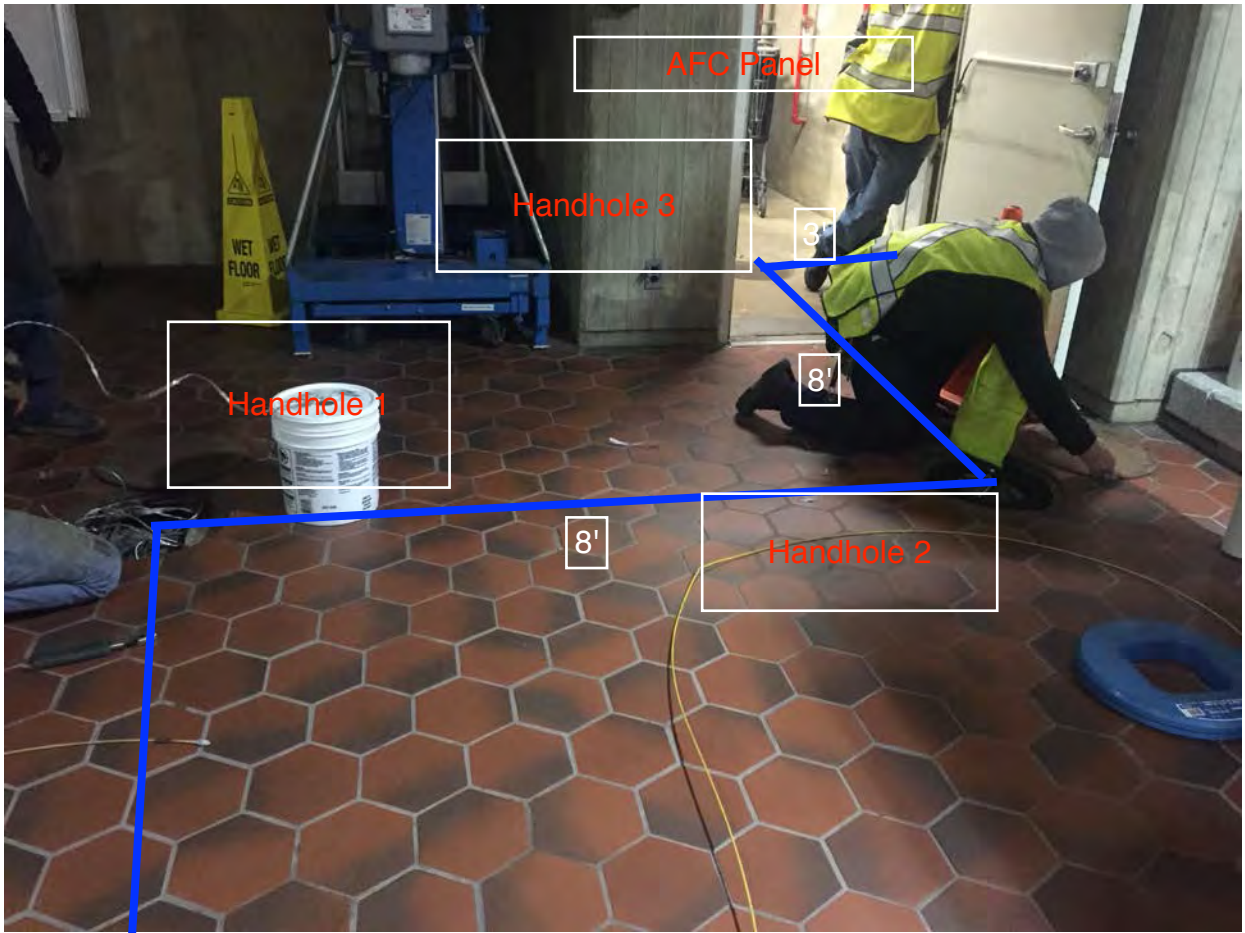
Existing duct run from Handhole 3 to AFC panel (Room 101)
